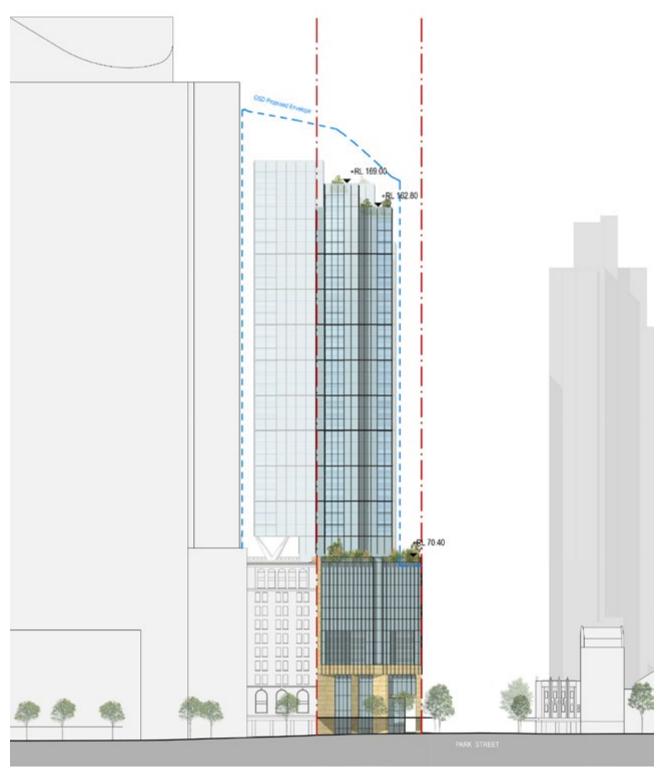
Pitt Street elevation of indicative OSD design scheme
